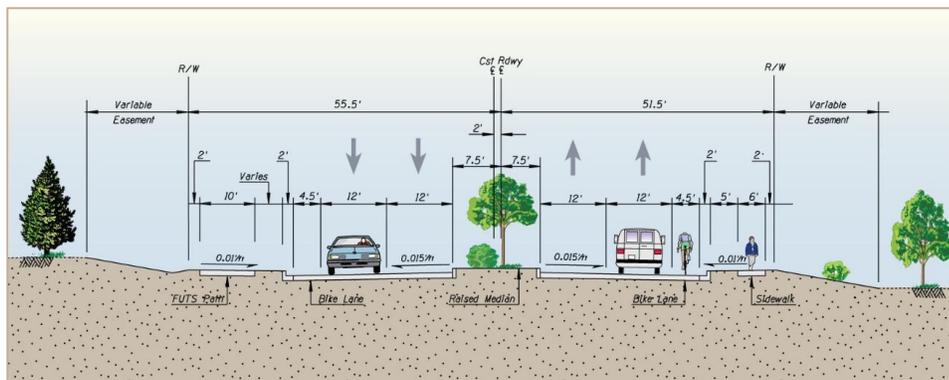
Fourth Street Corridor Complete Street typical cross-section
